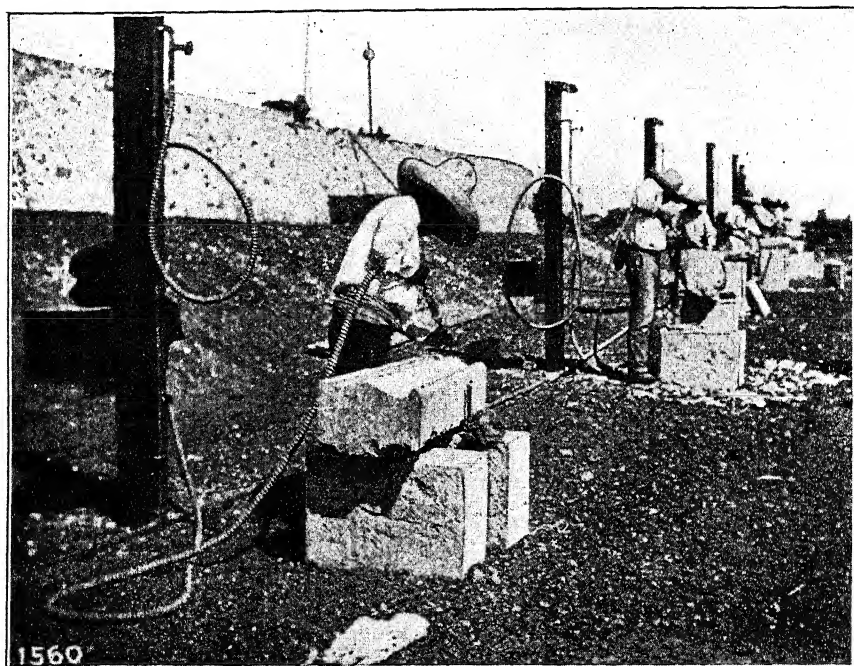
DRESSING STONE WITH PLUGGER DRILLS.
